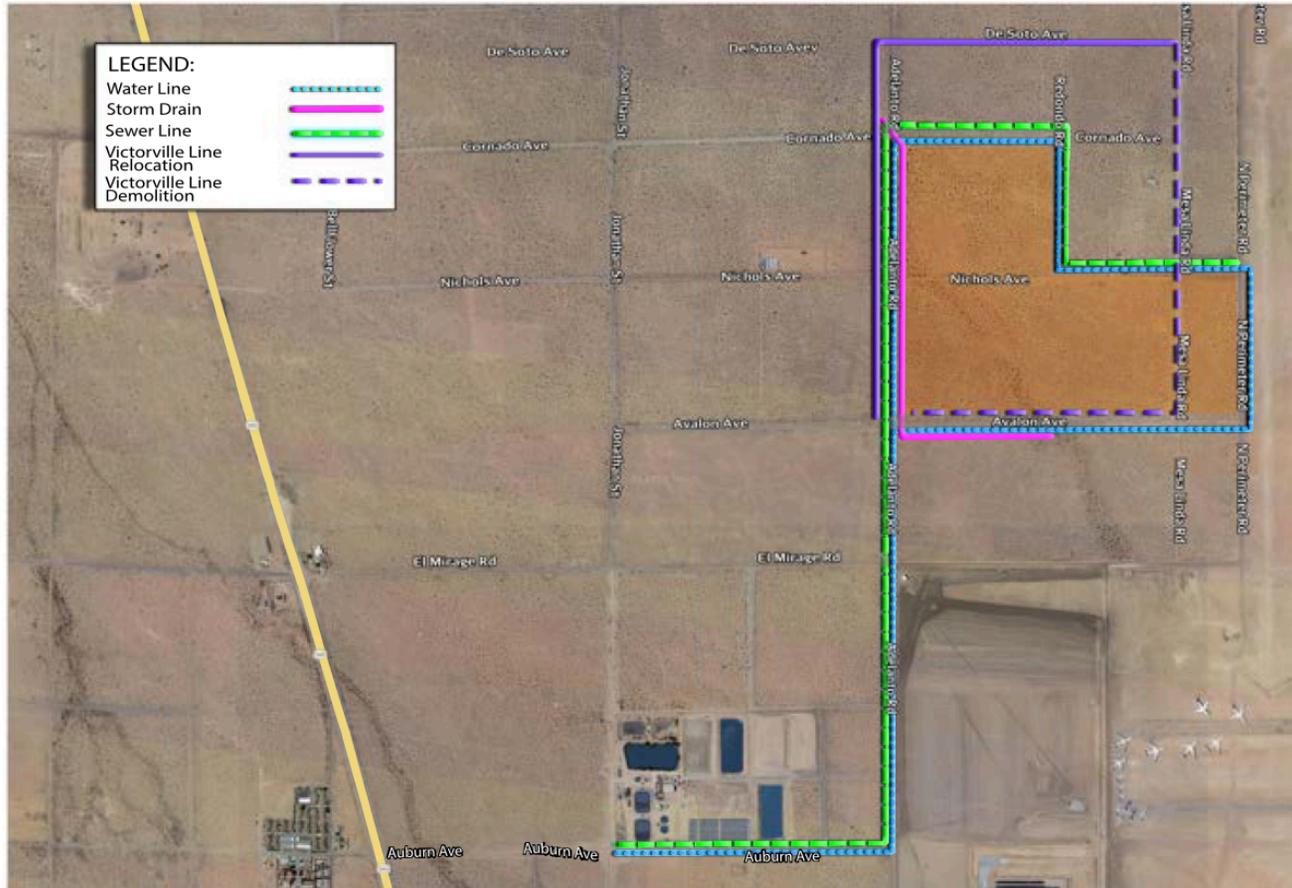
Adelanto Road Proposed Off-Site Improvements- N/O Intersection of Adelanto Road and Chamberlaine Way South to Aztec Lane
